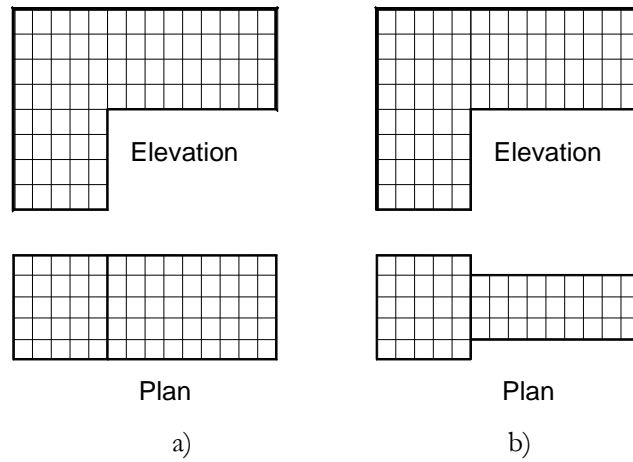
Description of the beam-column connections considered in the proposed modelling approach: a ) when the beam width is equal to the column width; b) when the beam width is smaller than the column width
